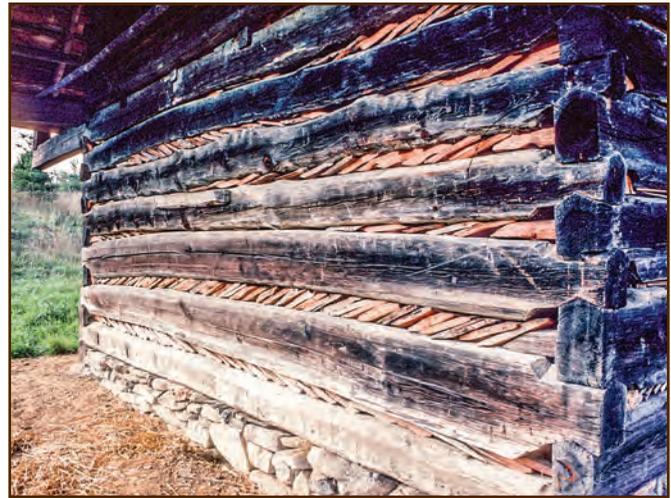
The builders used slate as chinking between the logs on this cabin. They laid the pieces of slate on wood blocking to angle them toward the outside of the building to help shed rain.
